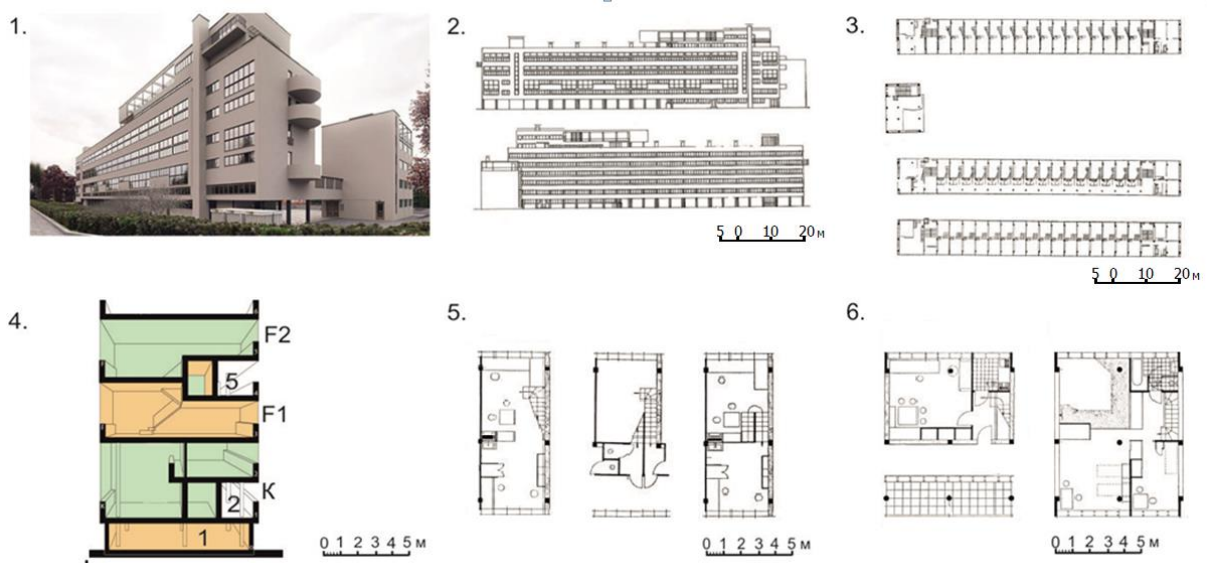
Narkomfin house: 1. General view. 2. Façades. 3. Plans for the fourth to sixth floors. 4. Section. 5. Plans of apartments F1 and F2. 6. Floor plan of apartment K. [15]
